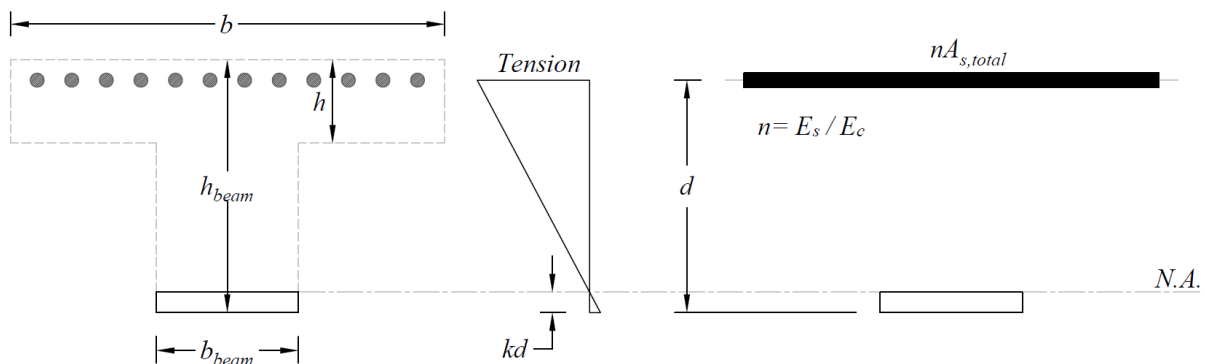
Cracked Transformed Section (Interior Negative Moment Section for End Span)
